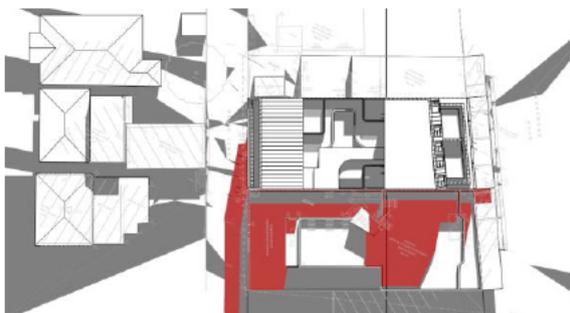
Proposed shadow diagram – 12 noon (Source: Arkhaus)
